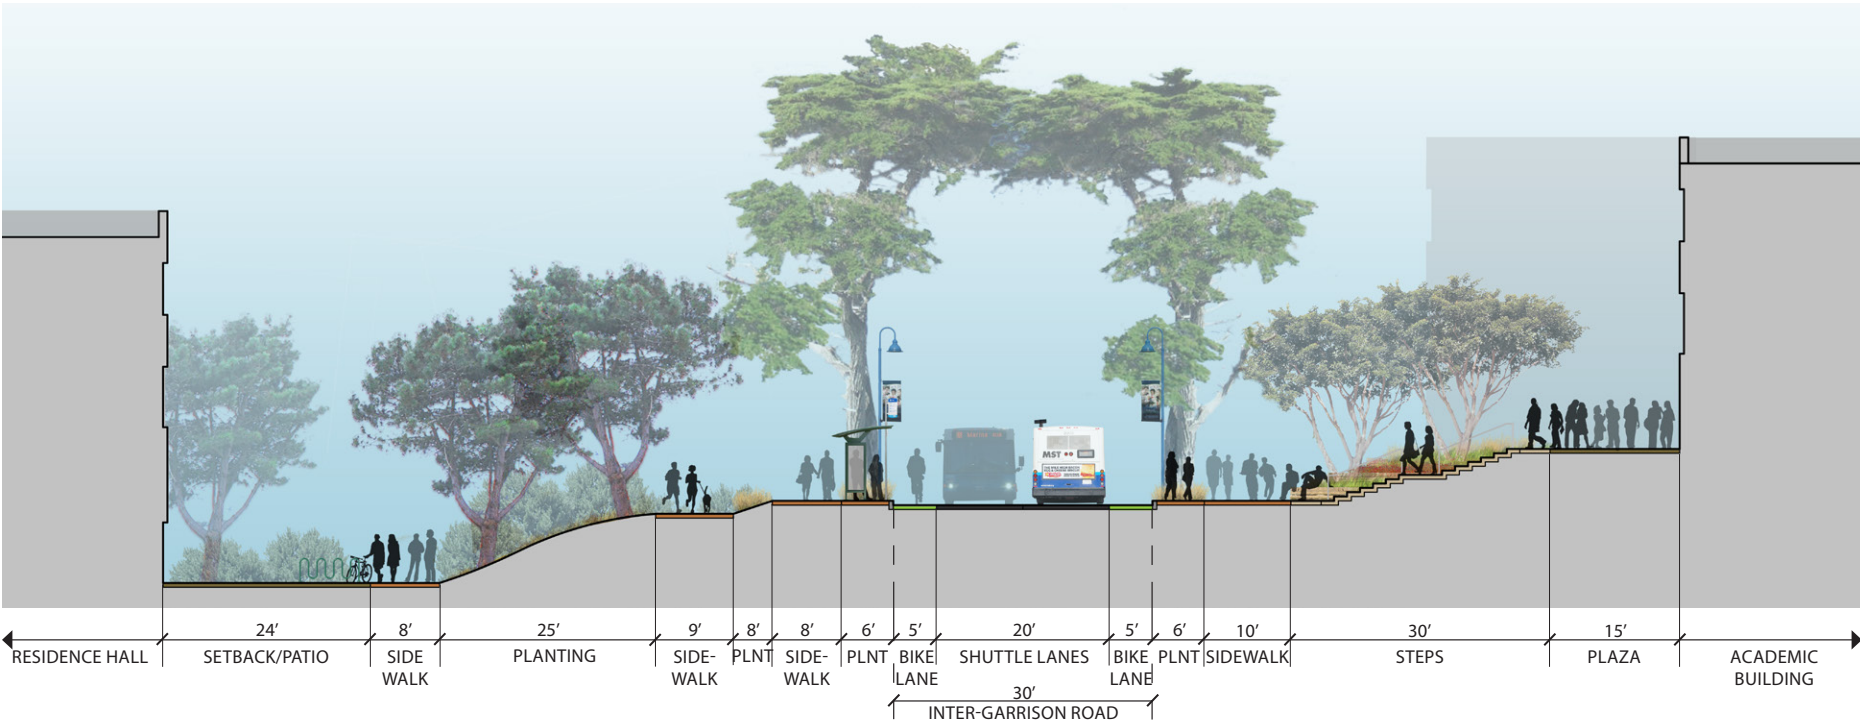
Inter-Garrison Road at Fourth Avenue Looking East
